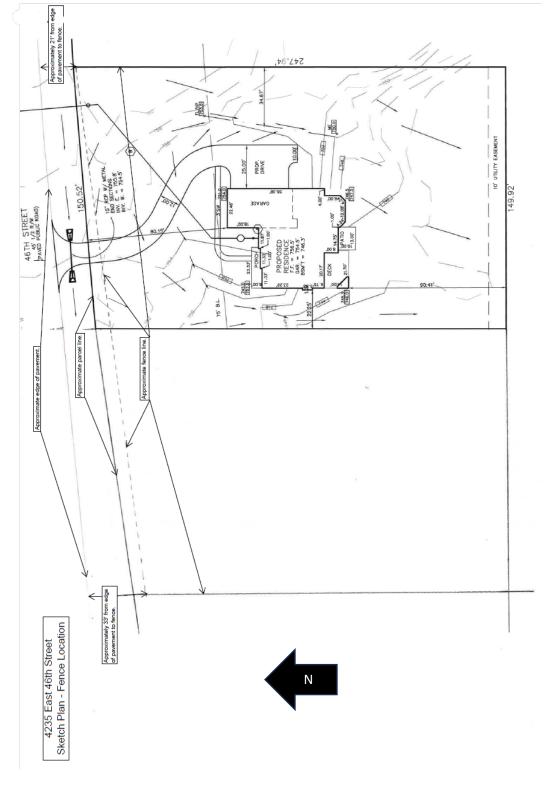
Site Plan of 4235 East 46<sup>th</sup> Street.
